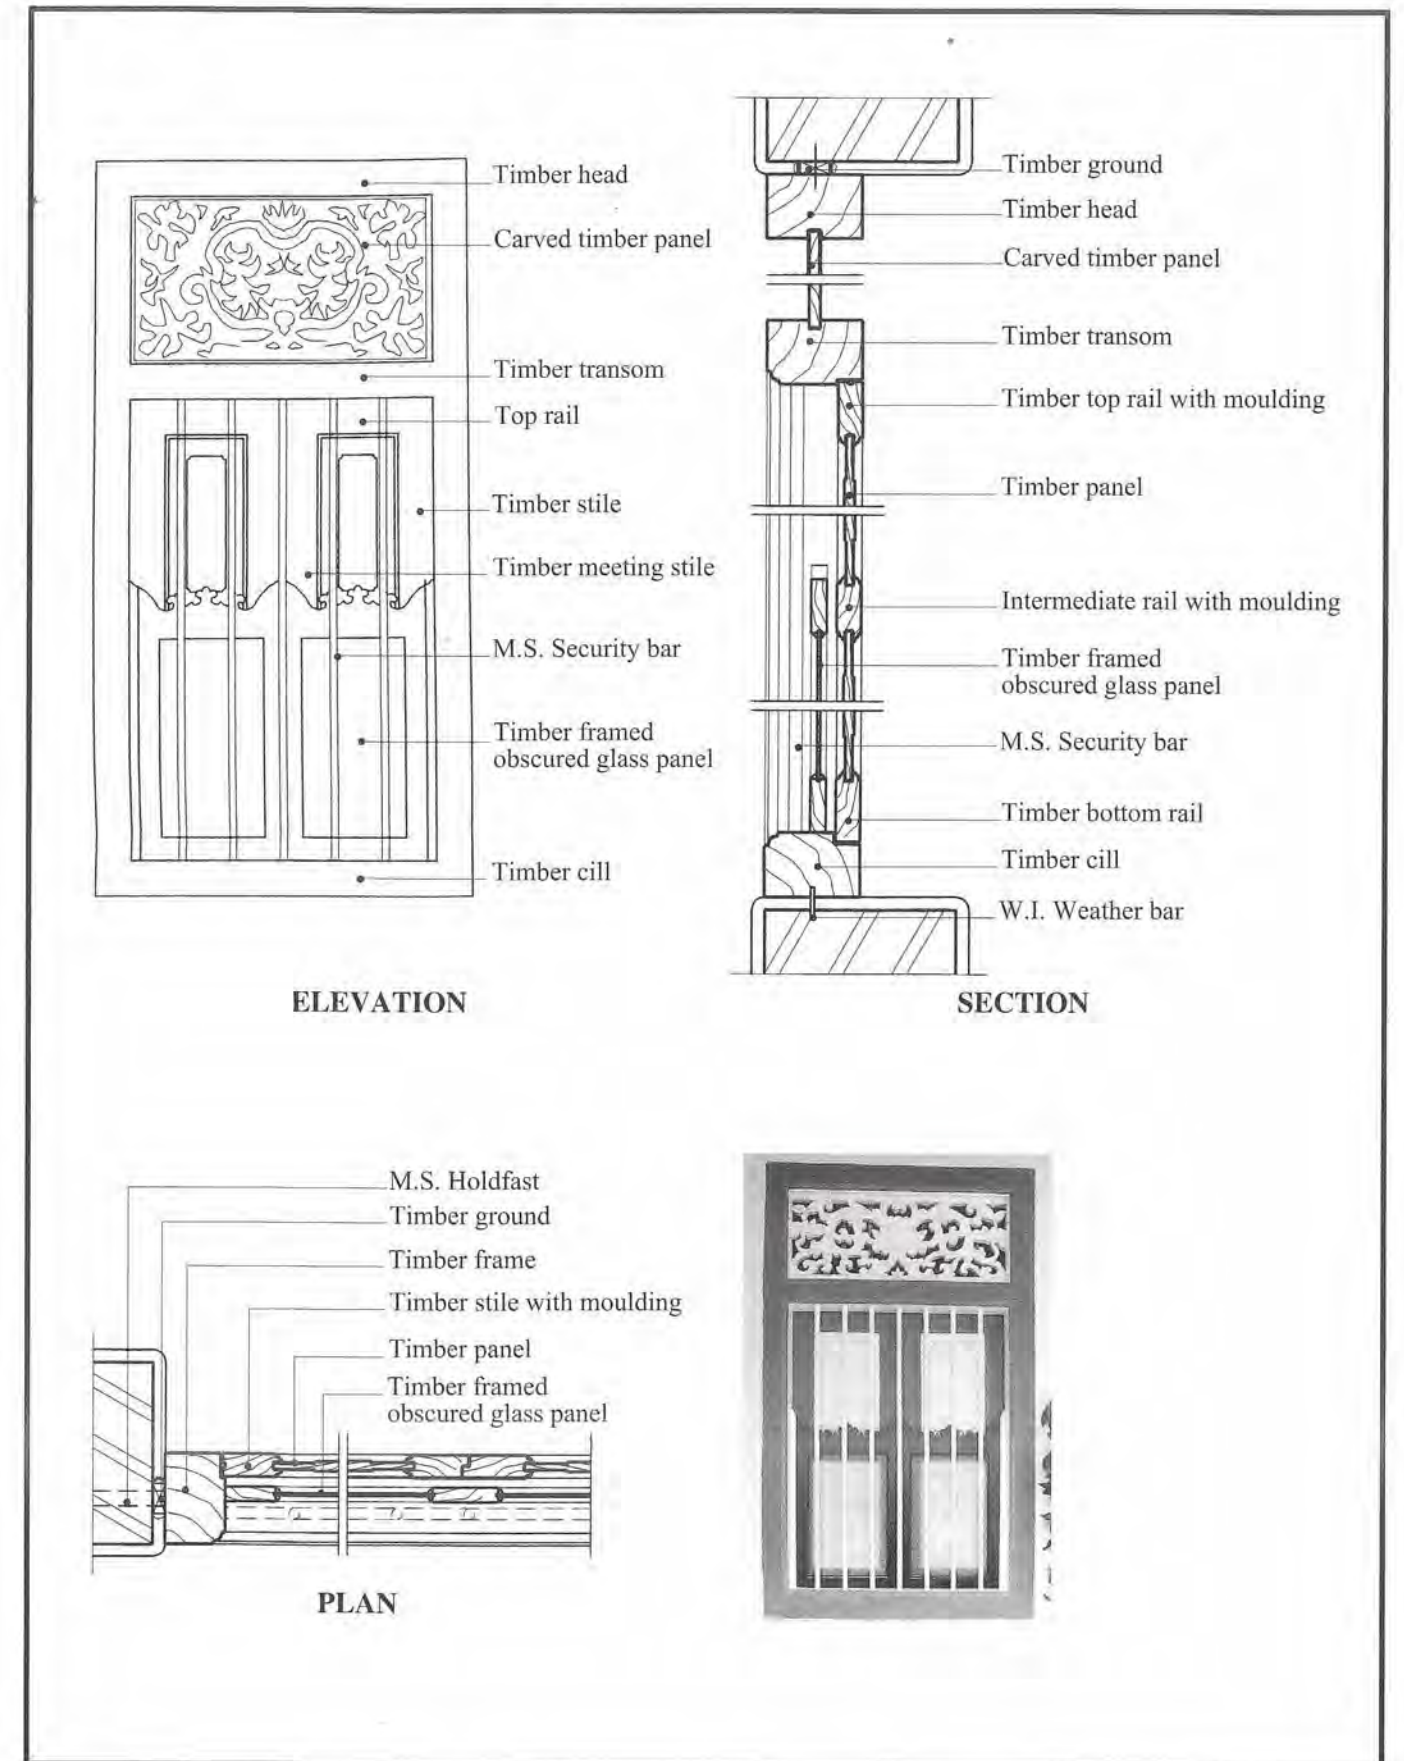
Elevation, Section and Plan of a typical casement window detail and an example of the restored element.
